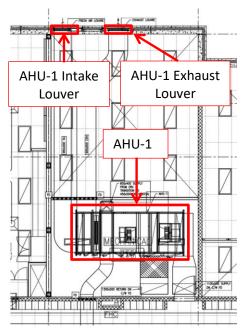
Second floor West mechanical room plan showing location of considered equipment.
